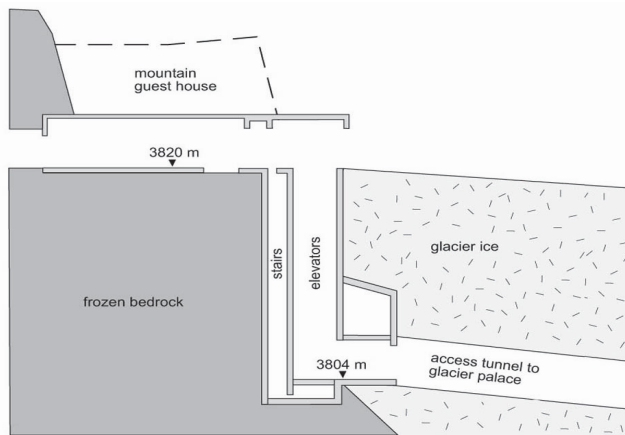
Cross section through guest house, old tunnel (3820 m) and elevator shafts with access to the glacier palace.
